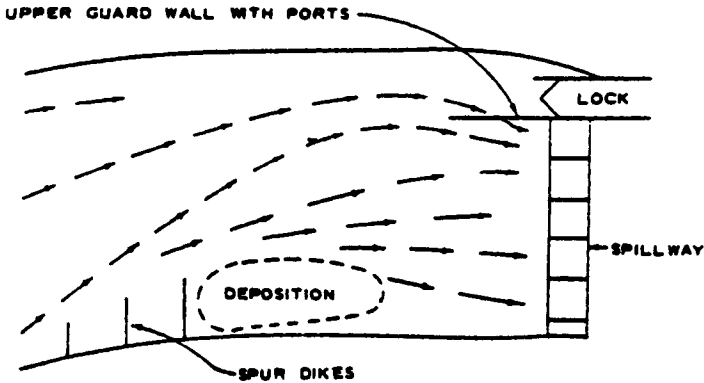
Training Structures Designed to Maintain Depths in the Upper Lock Approach.
